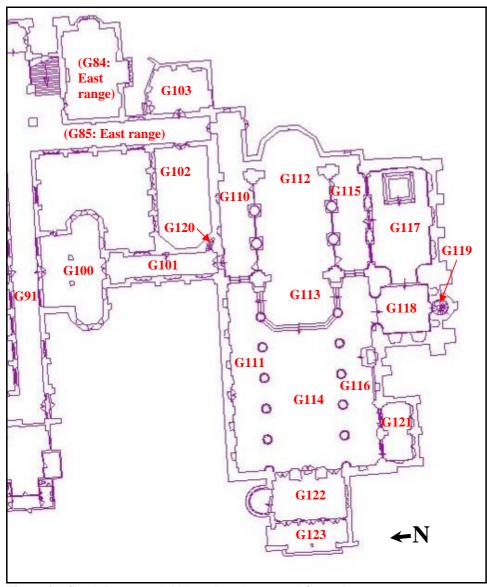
South Range and Abbey church - ground floor plan Based on a drawing by LDN Architects with permission. Not to scale.
